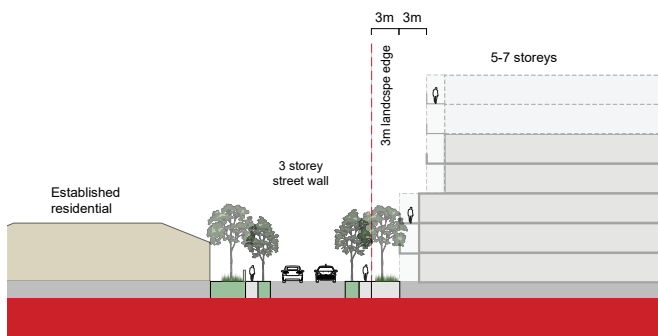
Roseberry Avenue, Civic Precinct. A 3m ground floor setback is proposed to respond to the landscaped character of the precinct and street.
